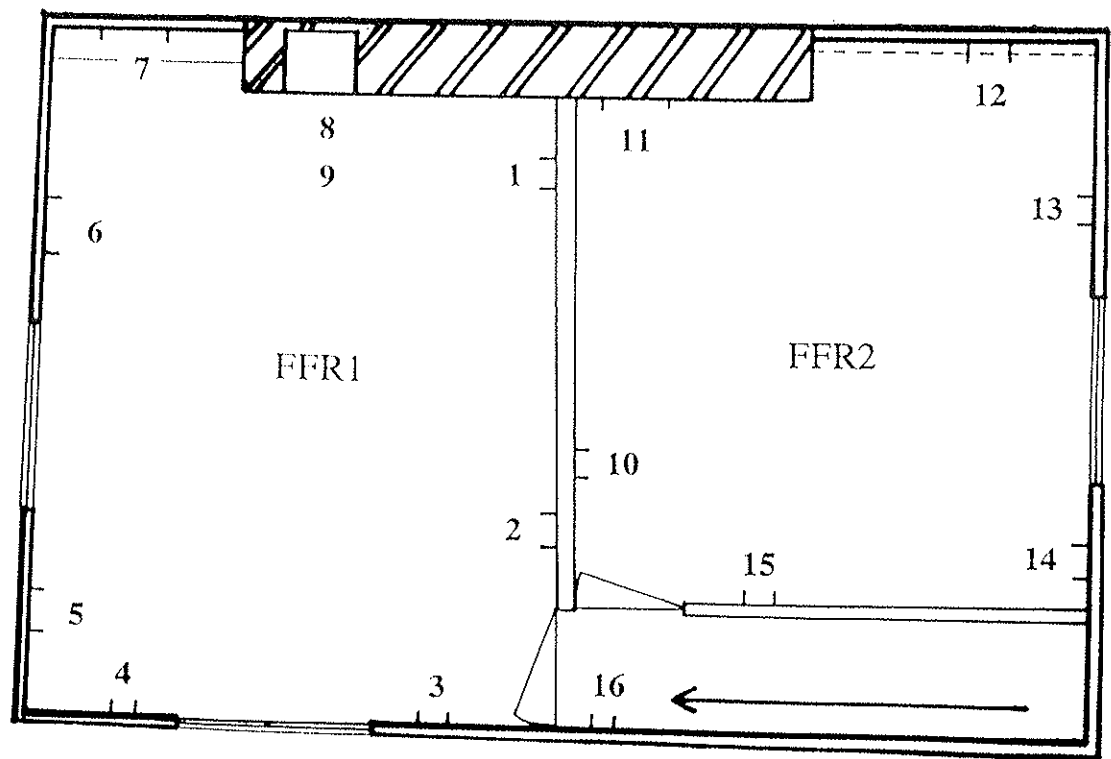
First Floor Plan Sketch Plan. Showing location of investigative openings.
